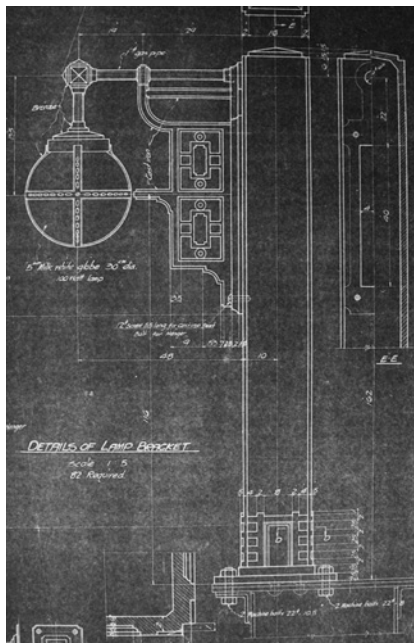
Lamp Post (Owari-Ohashi Bridge)
